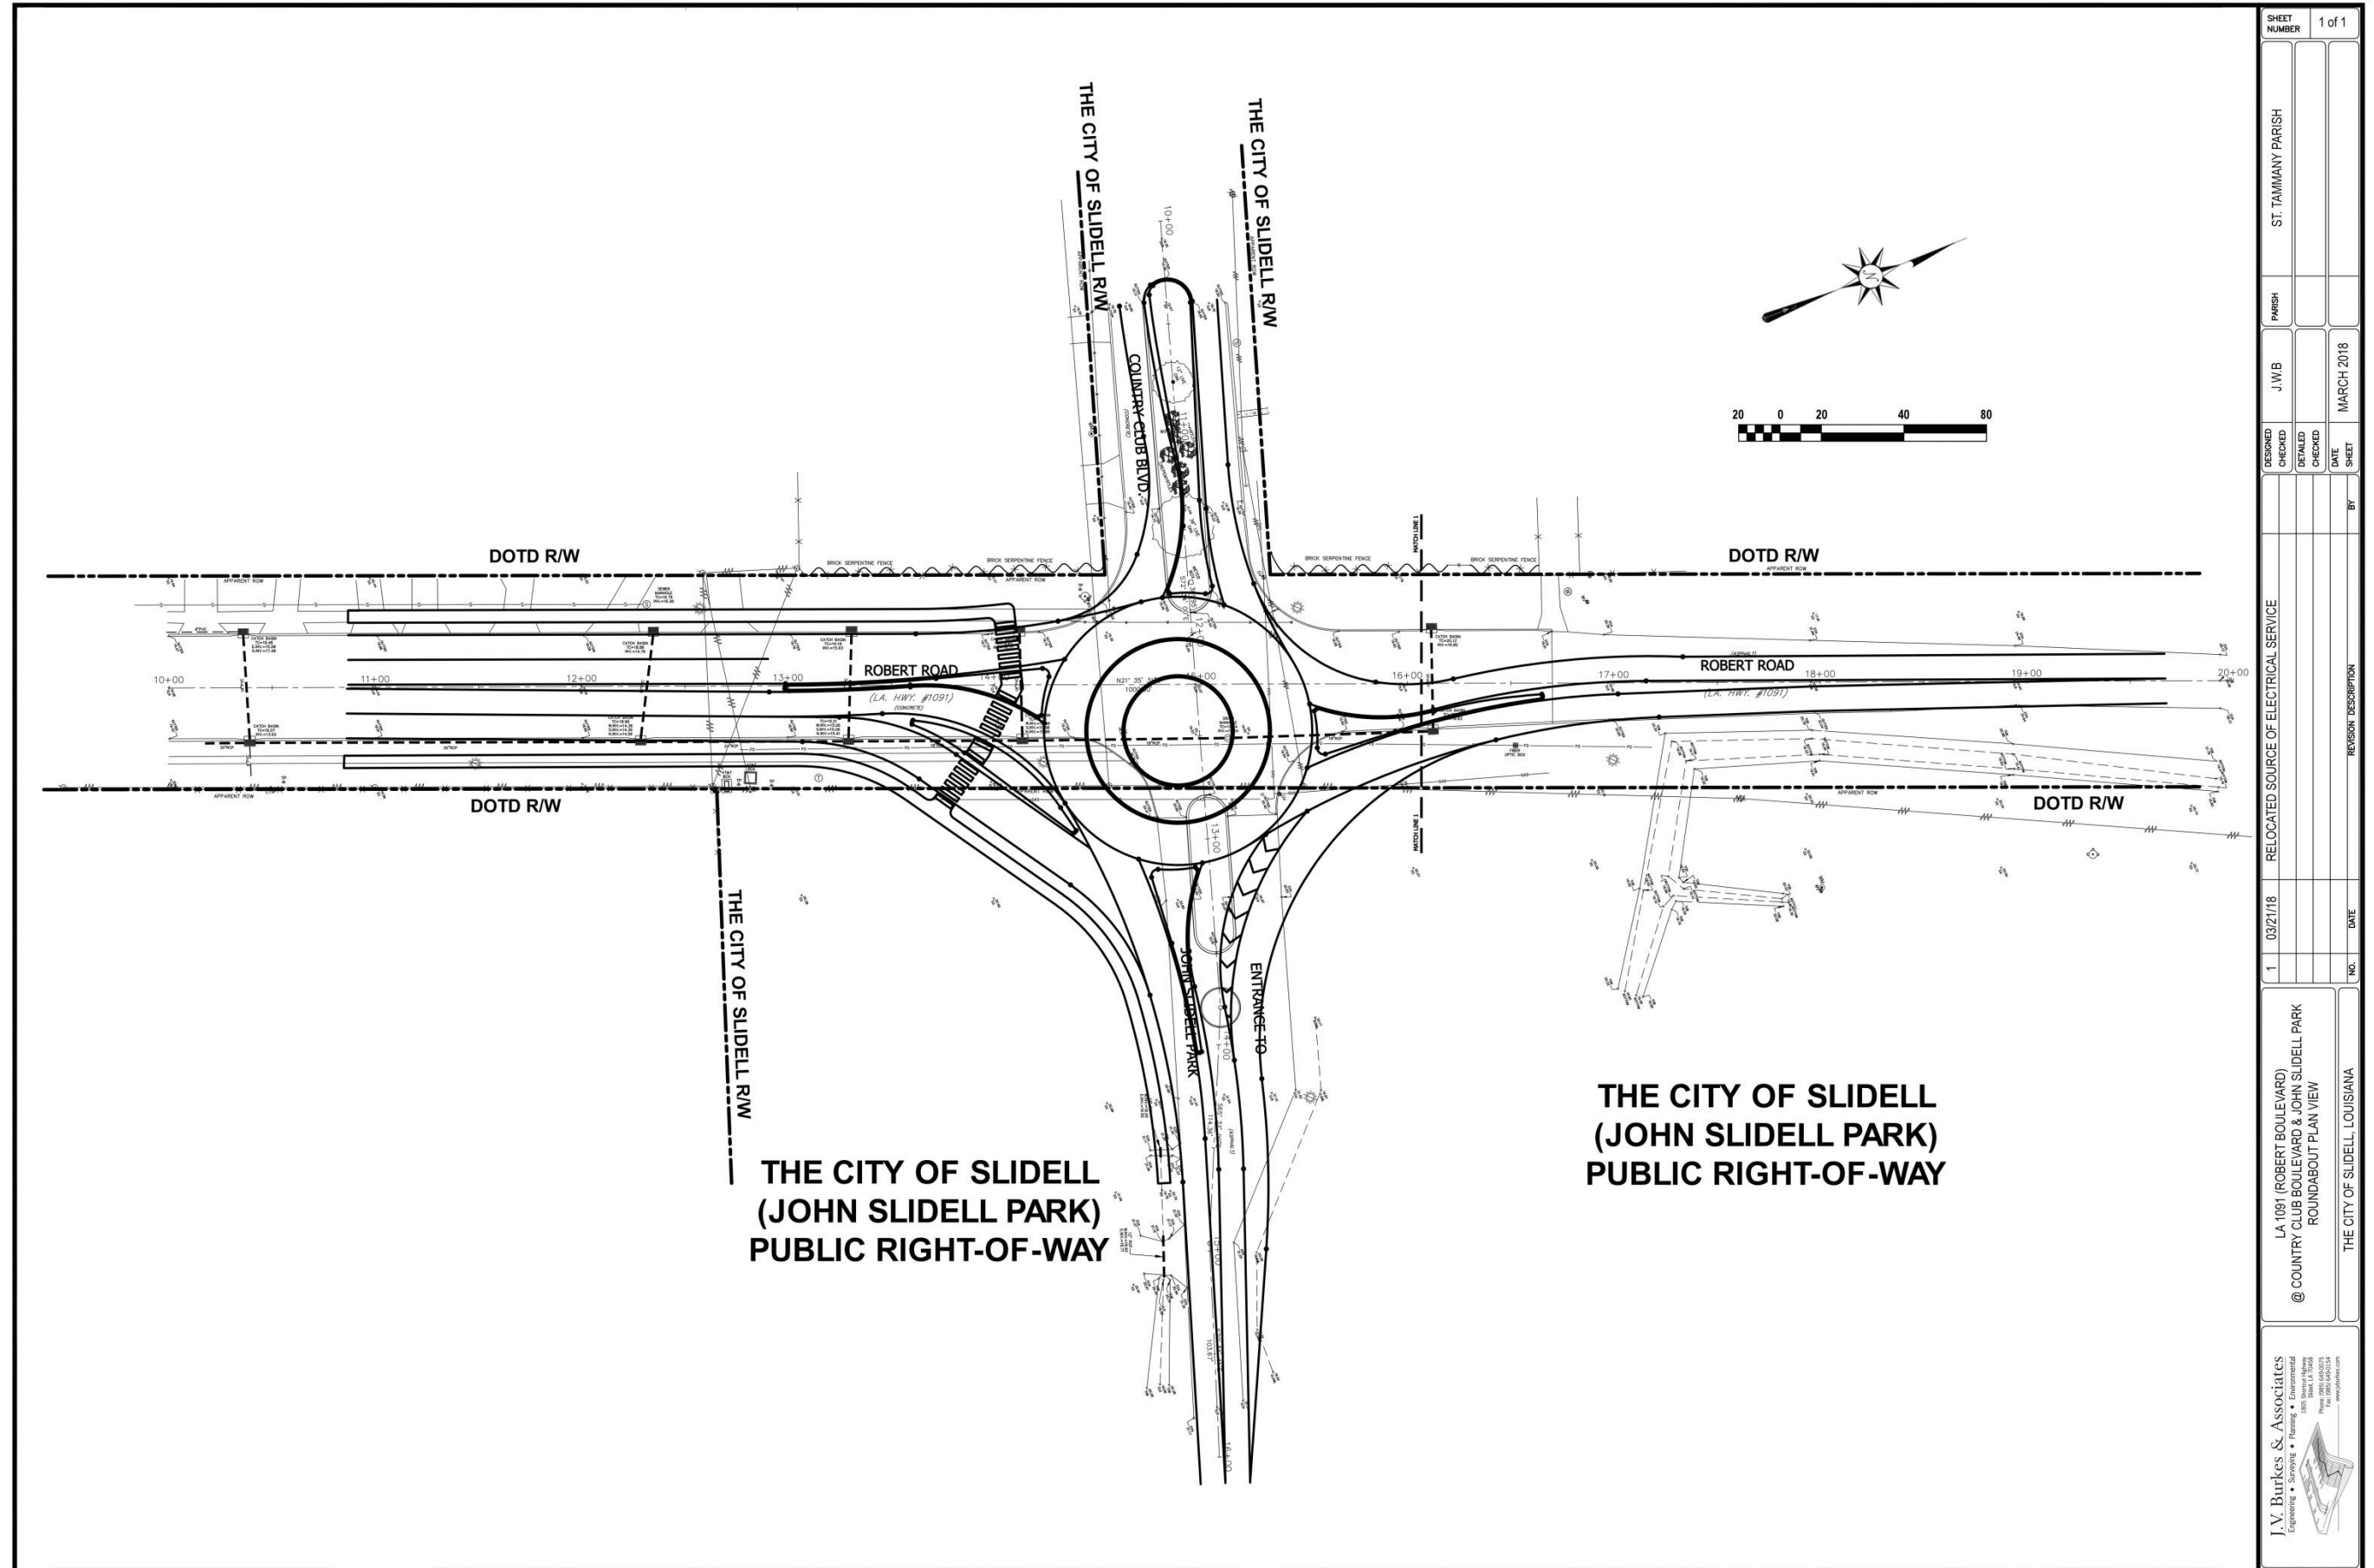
RECOMMENDED ROUNDABOUT LAYOUT DESIGN (PLAN VIEW)
